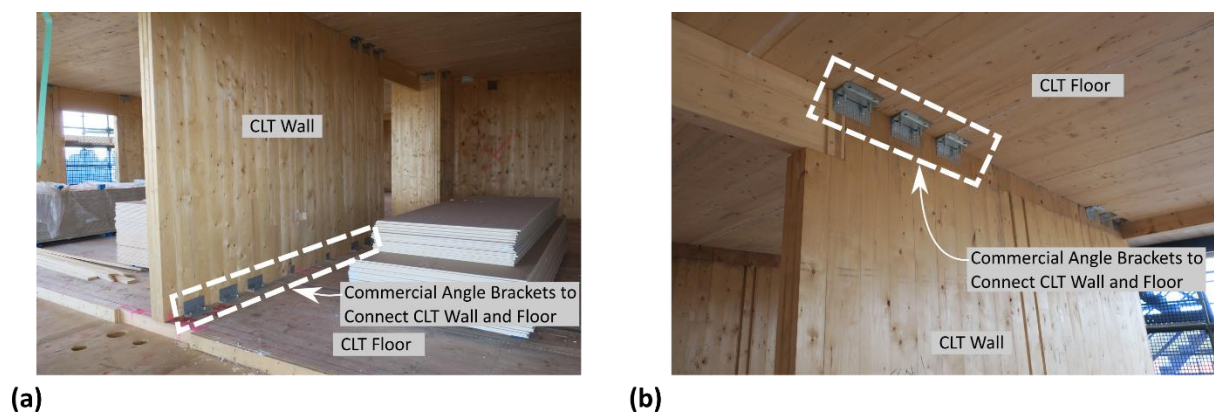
Photos of Aveo Norwest 10-storey CLT building c/o Andy Buchanan of PTL | Structural Consultants. (a) CLT wall to floor below angle bracket detail, (b) CLT wall to floor above angle bracket detail (image taken from Brown et al. (2021))
